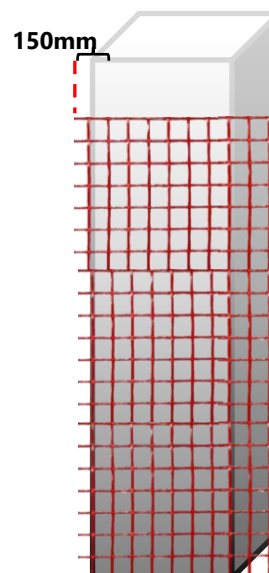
Reinforcement mesh on abutment. The mesh should protrude on both sides of the concrete element by at least 100-150 mm at the joints.
